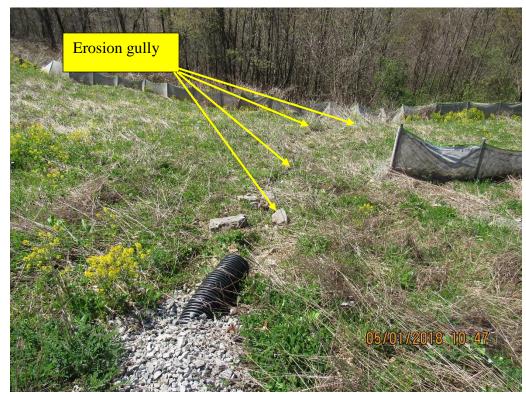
Unprotected outlet of amphitheater drainage creating erosion gully along slope.
